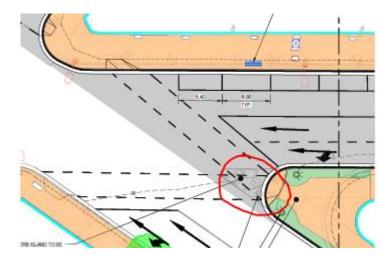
Intersecting Carrington Road south arm and Bronte Road south arm.
